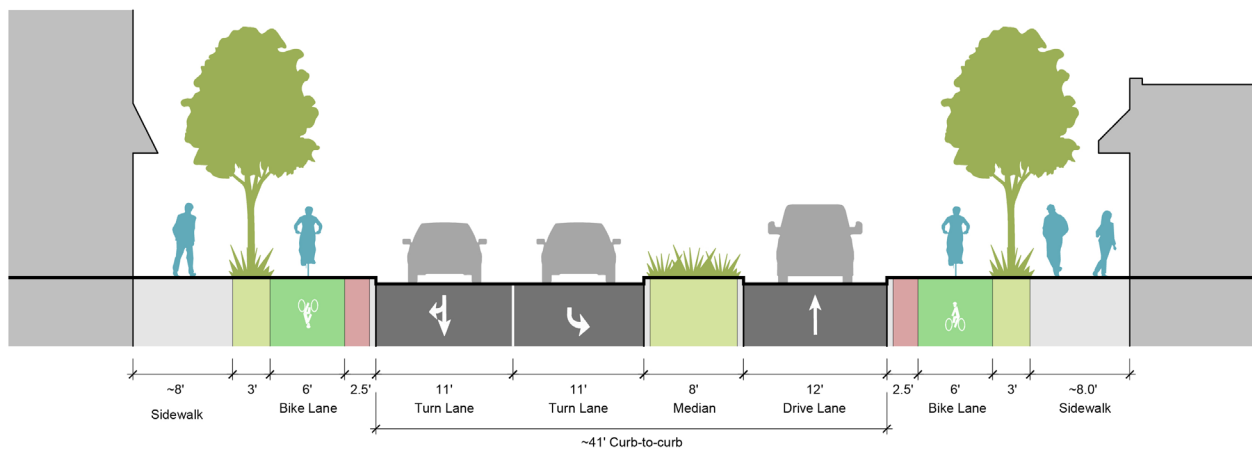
Dorchester Street and Old Colony Intersection Long-Term Improvements - Typical Section
